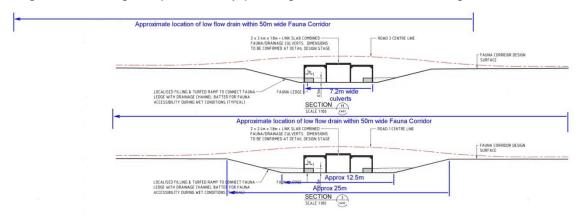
Applicant's fauna crossing plan submitted Jan 2014 (Part of Plan No YC0229-11E1-FC01 Revision E) with blue notation added for clarity by Council
